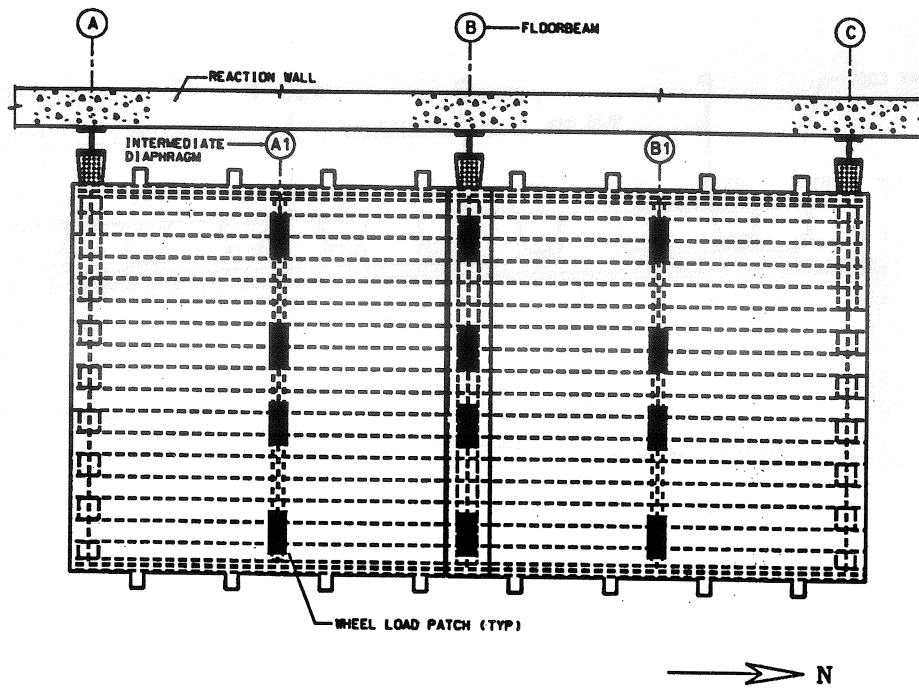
Plan View of Test Deck Showing Wheel Load Patch Locations
